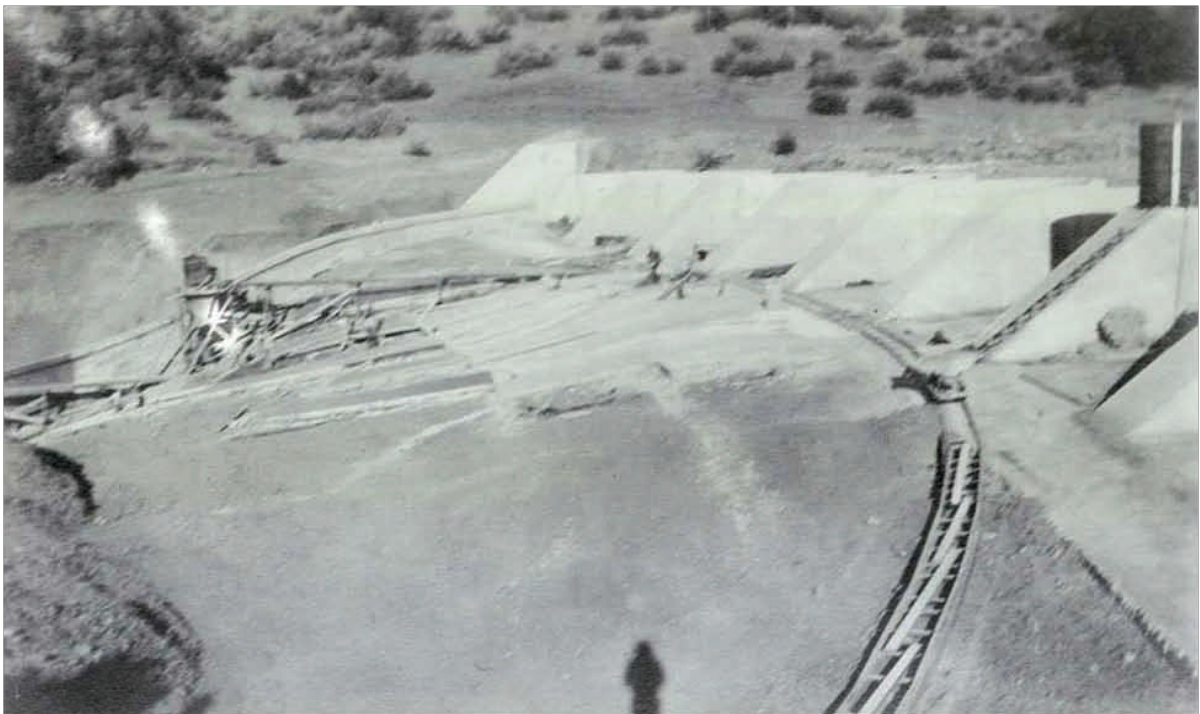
Spillway extension construction in 1911. View is from the south end looking north. Note the flooring (apron) at the base of the piers. The new flooring is extended out 160 feet and has sides that form a funnel-like structure
